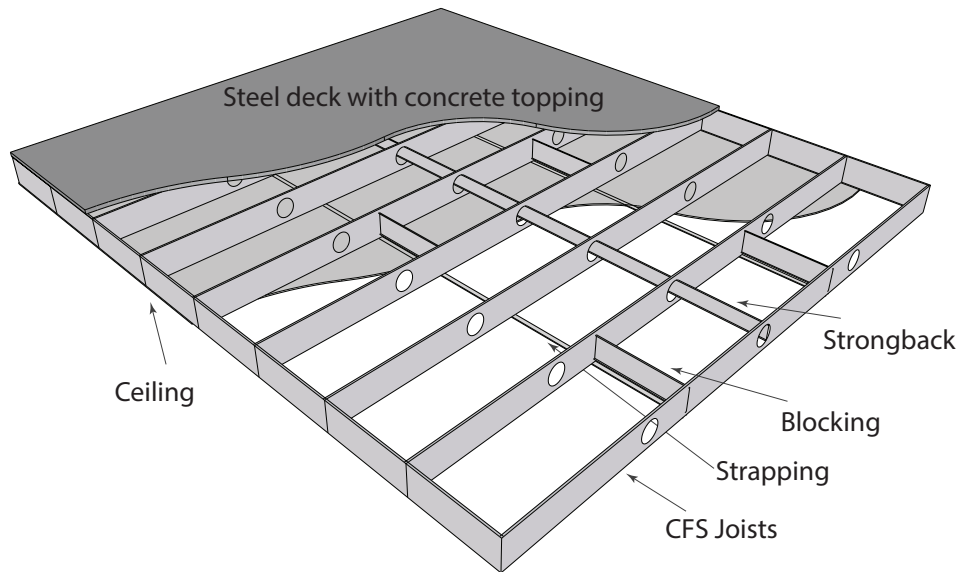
A long-span CFS floor with steel deck and concrete topping.
